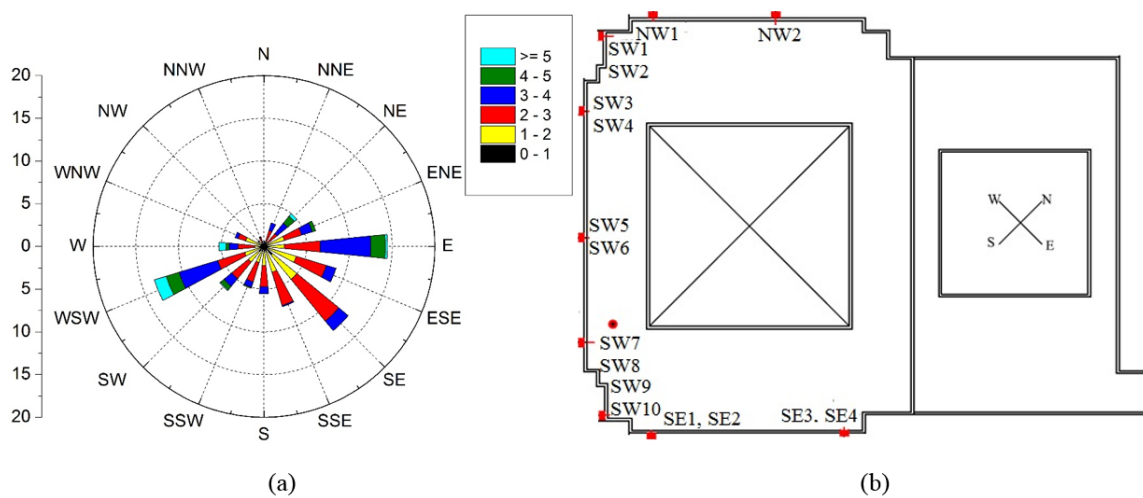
(a) Prevailing wind direction during rain hours for the entire monitoring period; (b) Plan view with rain gauge locations of HB Building in Montreal
